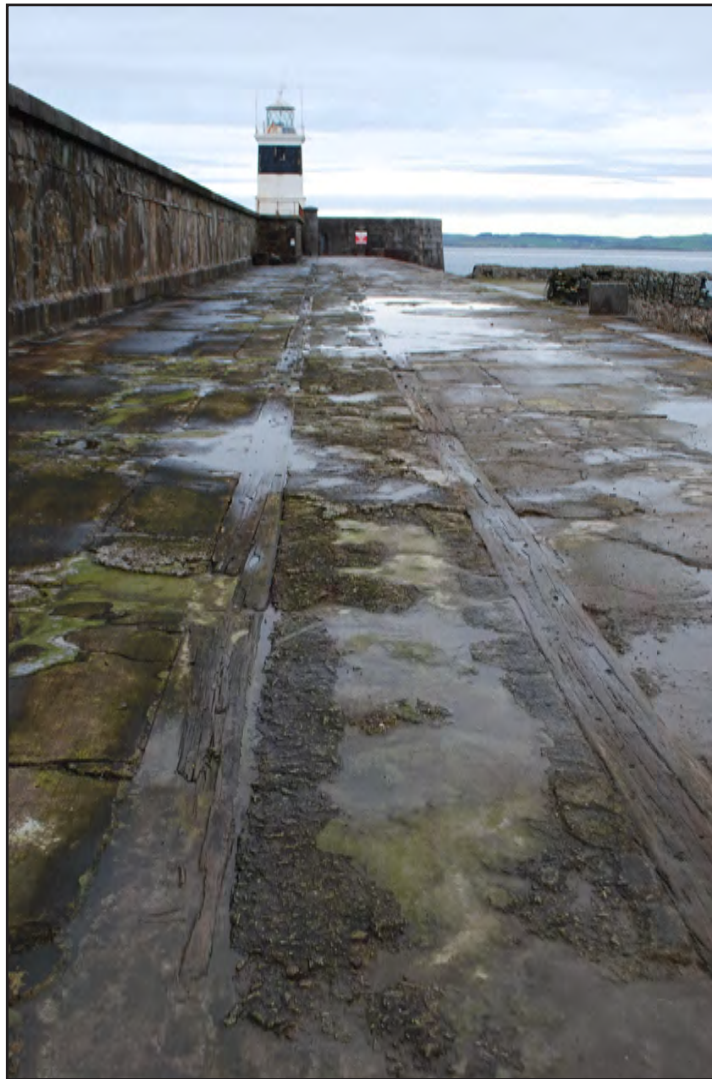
Holyhead Breakwater - view from west of wooden sleepers located along lower breakwater walkway near the lighthouse (archive image: G2498_022).
